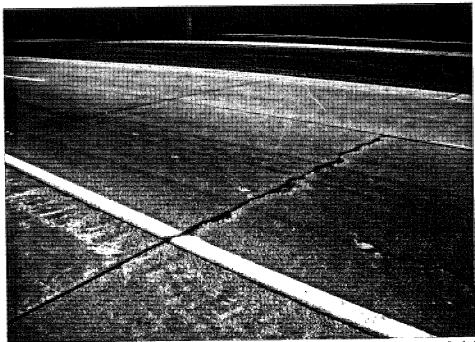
Typical crack pattern in section MI1-1, peastone concrete on open-graded drainage course.
